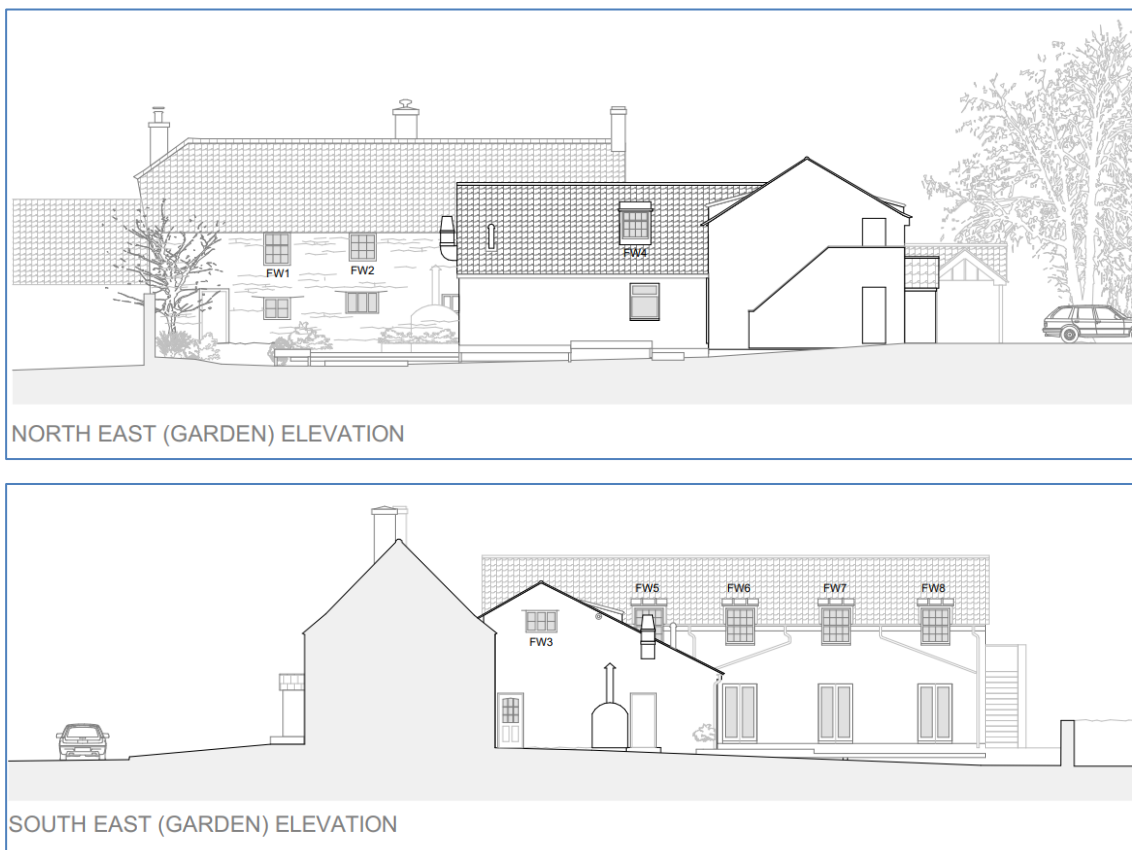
and 5. Extracts from Plans showing the position of the windows proposed for replacement.
